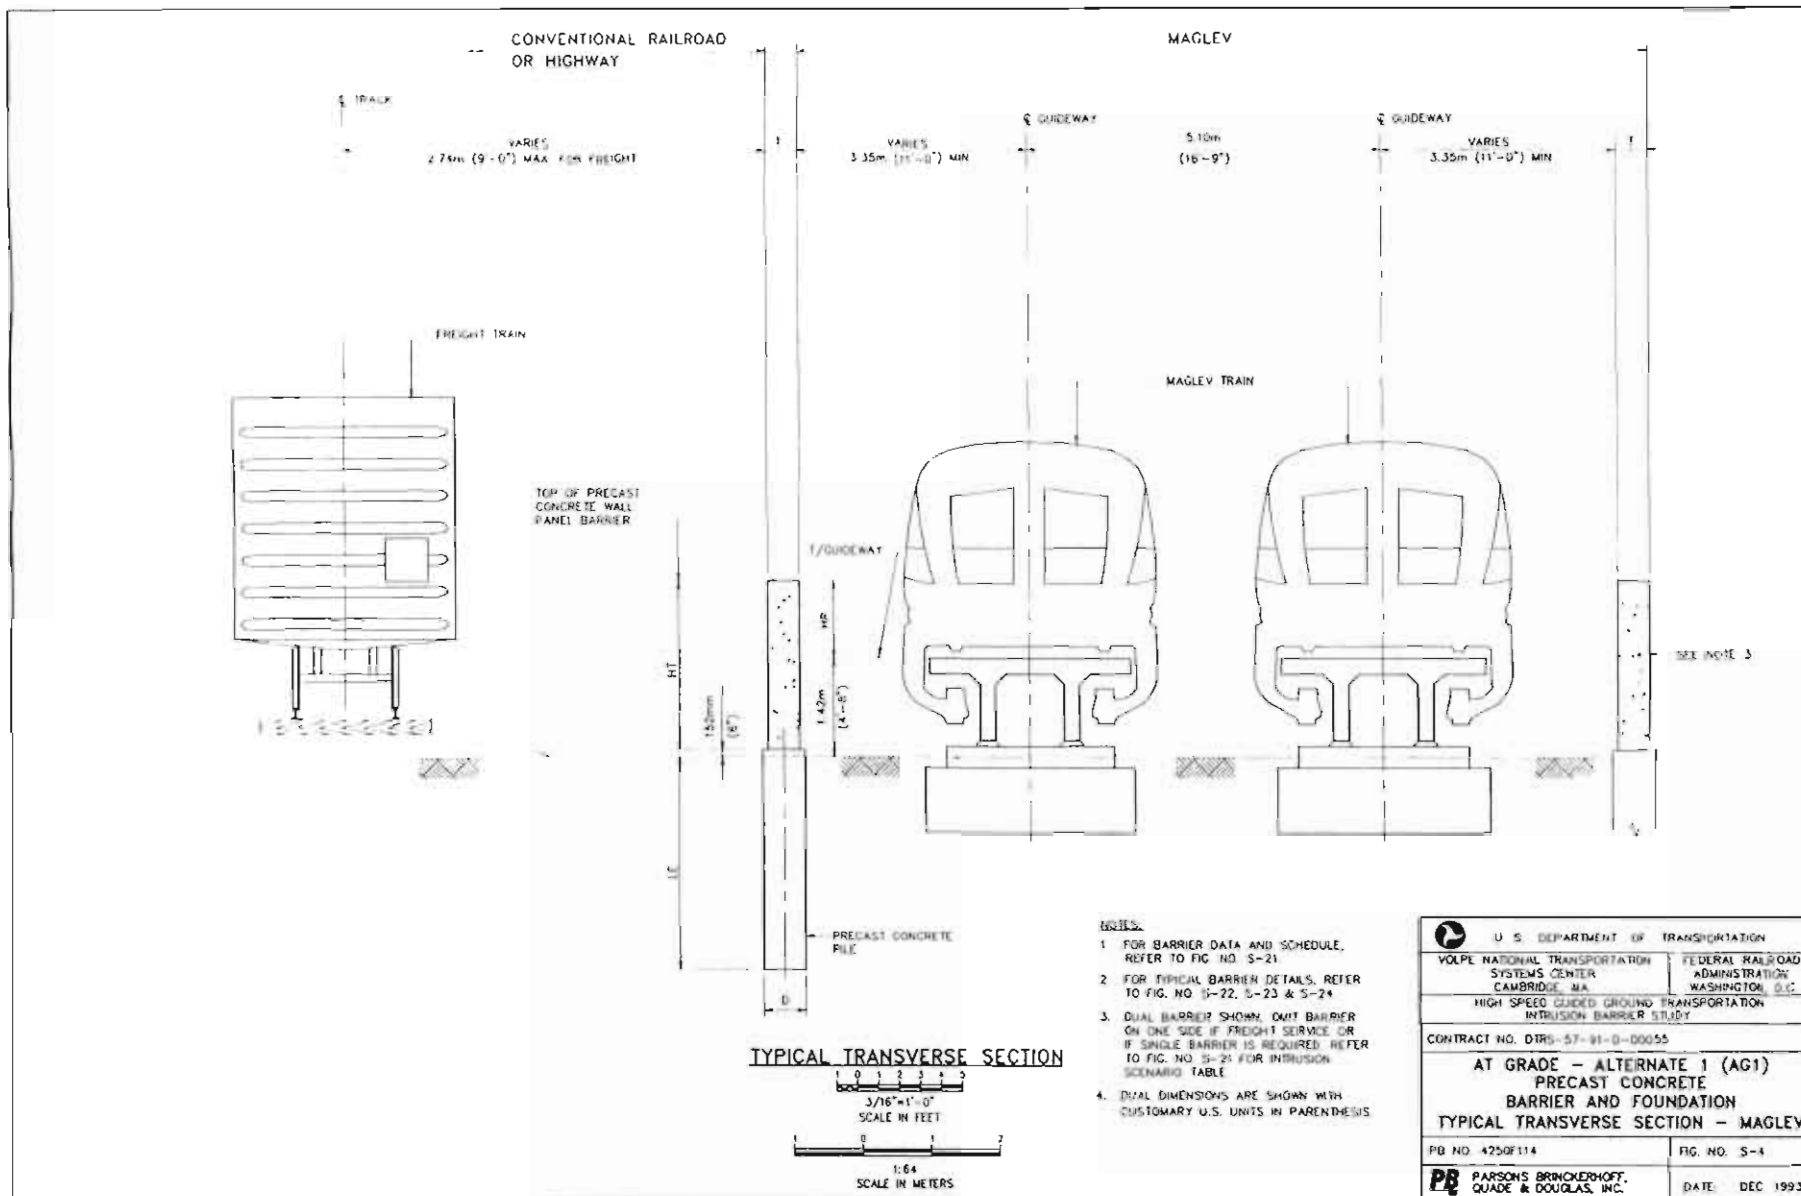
AT GRADE ALTERNATE 1: P/C WALL AND P/C FOUNDATION - TRANSVERSE SECTION/MAGLEV
